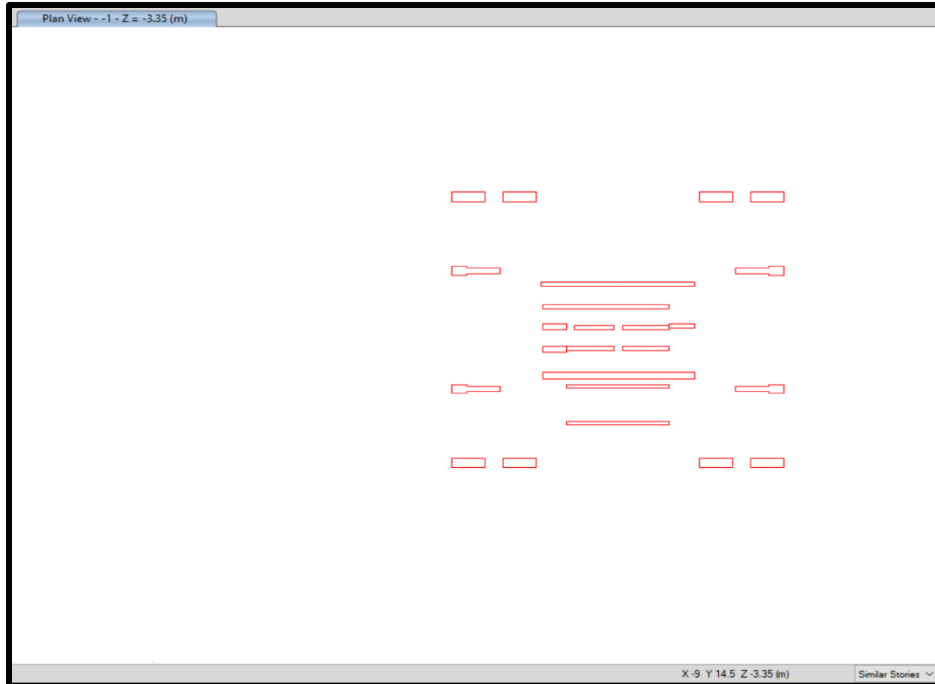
1st Basement Floor Shear Walls to be Assigned with (Similar Stories)
